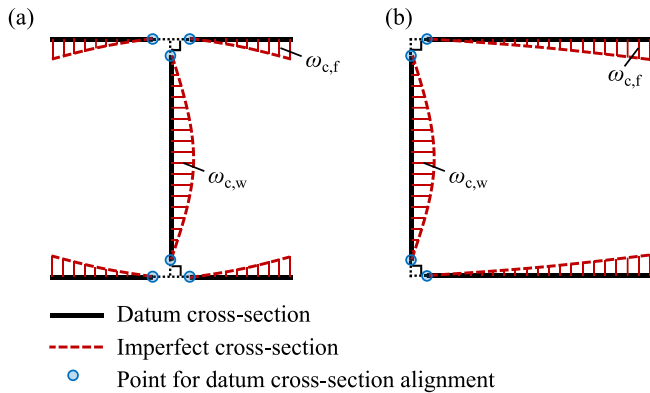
Definitions of cross-section imperfection for (a) I-sections and (b) C-sections.
